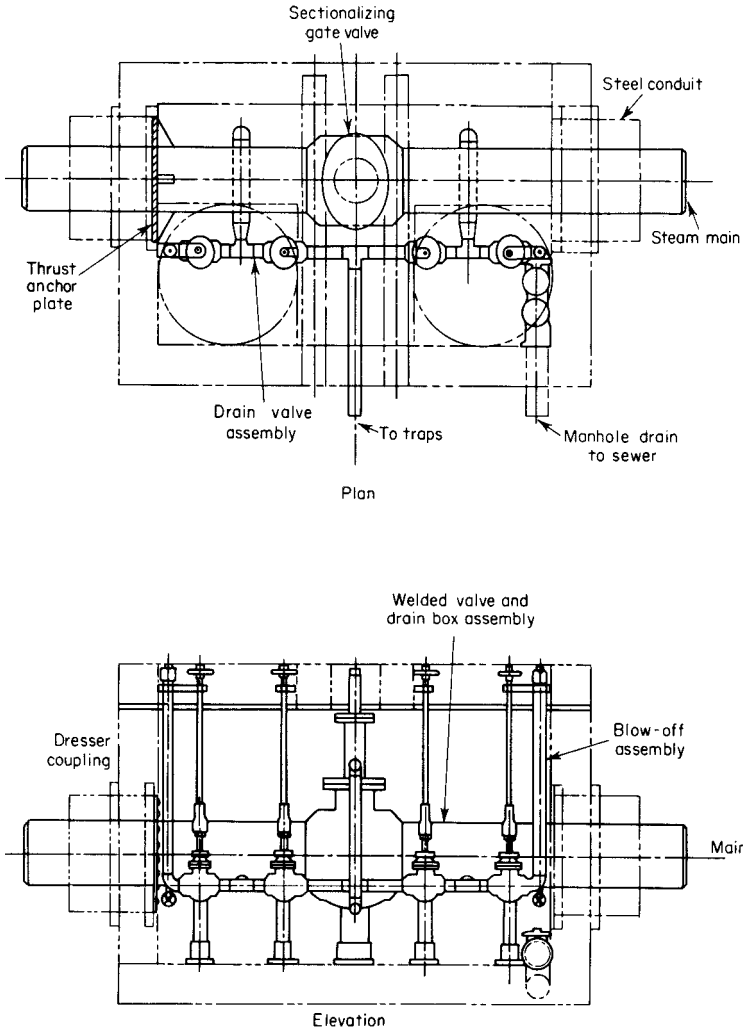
Manhole for sectionaling valve and drain valve assembly.
